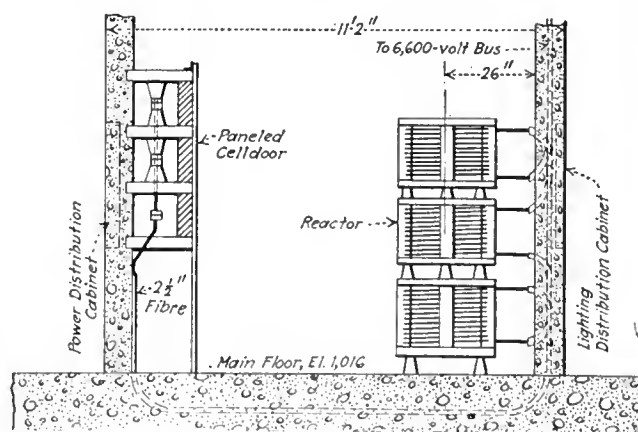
REACTOR CONNECTIONS ARE MADE THROUGH WALL CONDUITS
